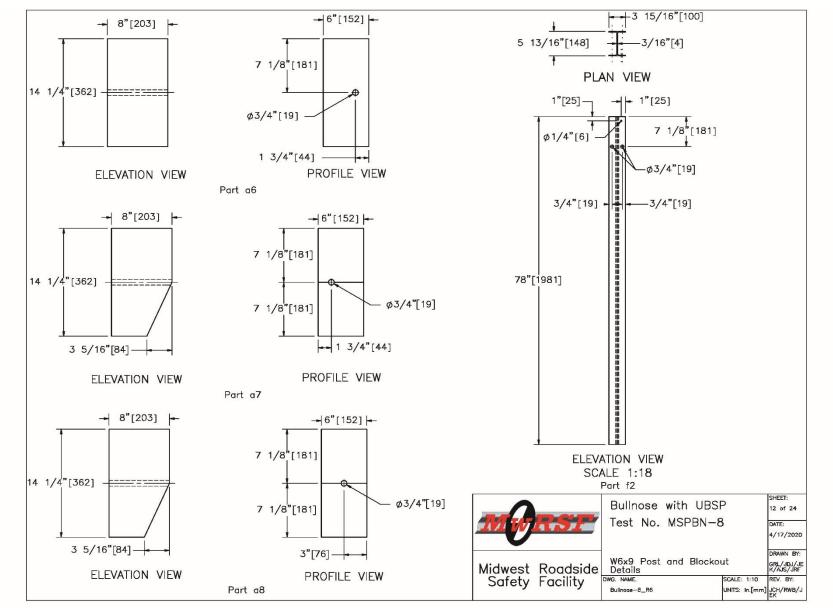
W6x9 Post and Blockout Details, Test No. MSPBN-8
